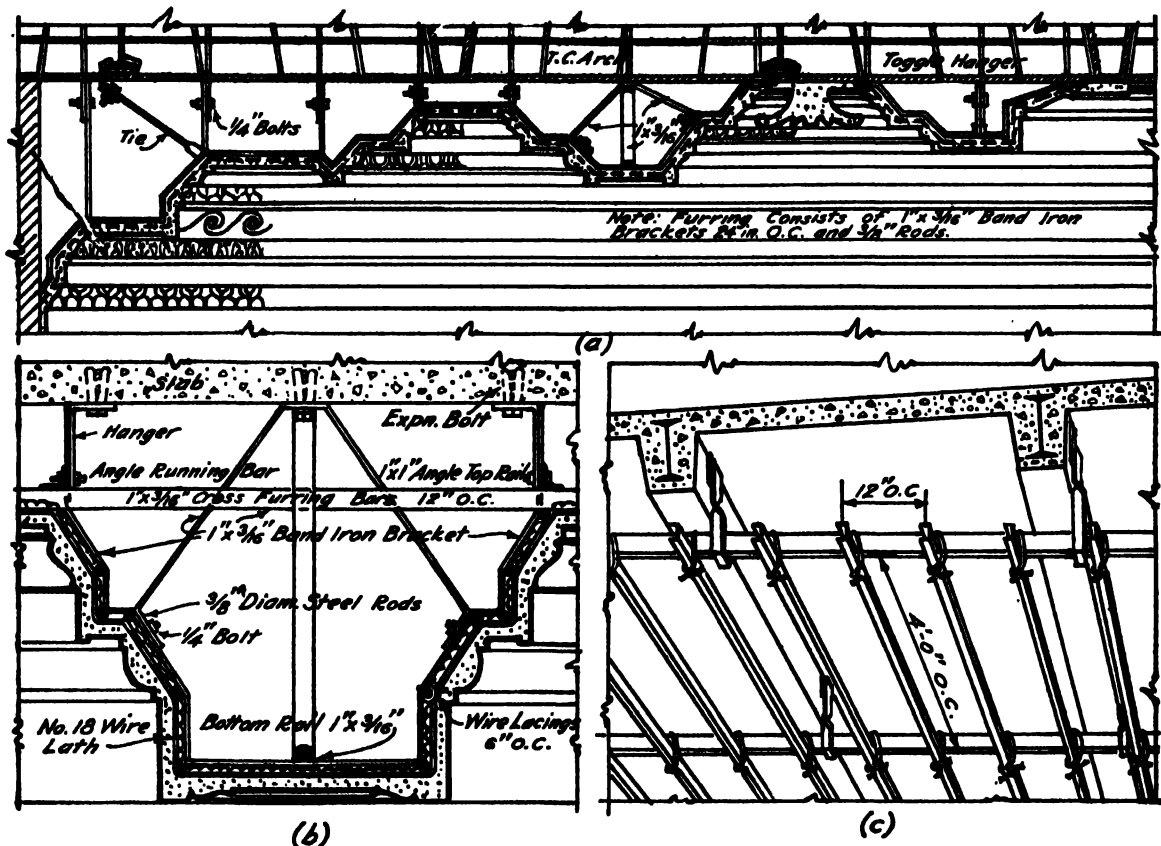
SUSPENDED CEILINGS AND METAL LATH FURRING\
